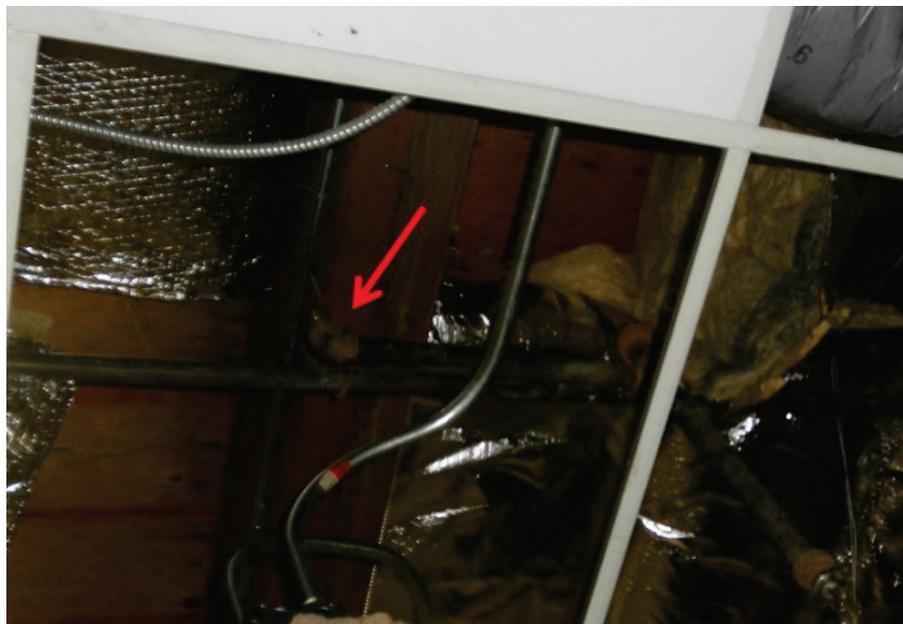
Sprinkler head interaction with adjacent components resulted in extensive flooding.
